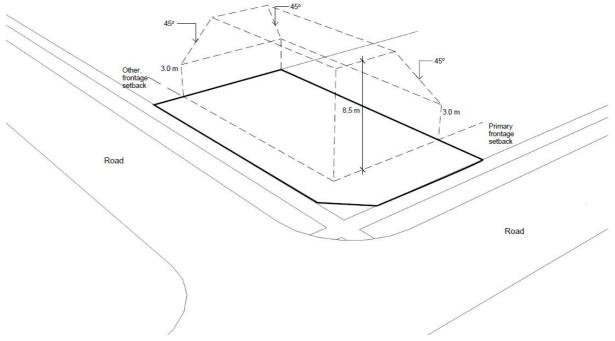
Building envelope for corner lots as required by clause 10.4.2 A3(a)
